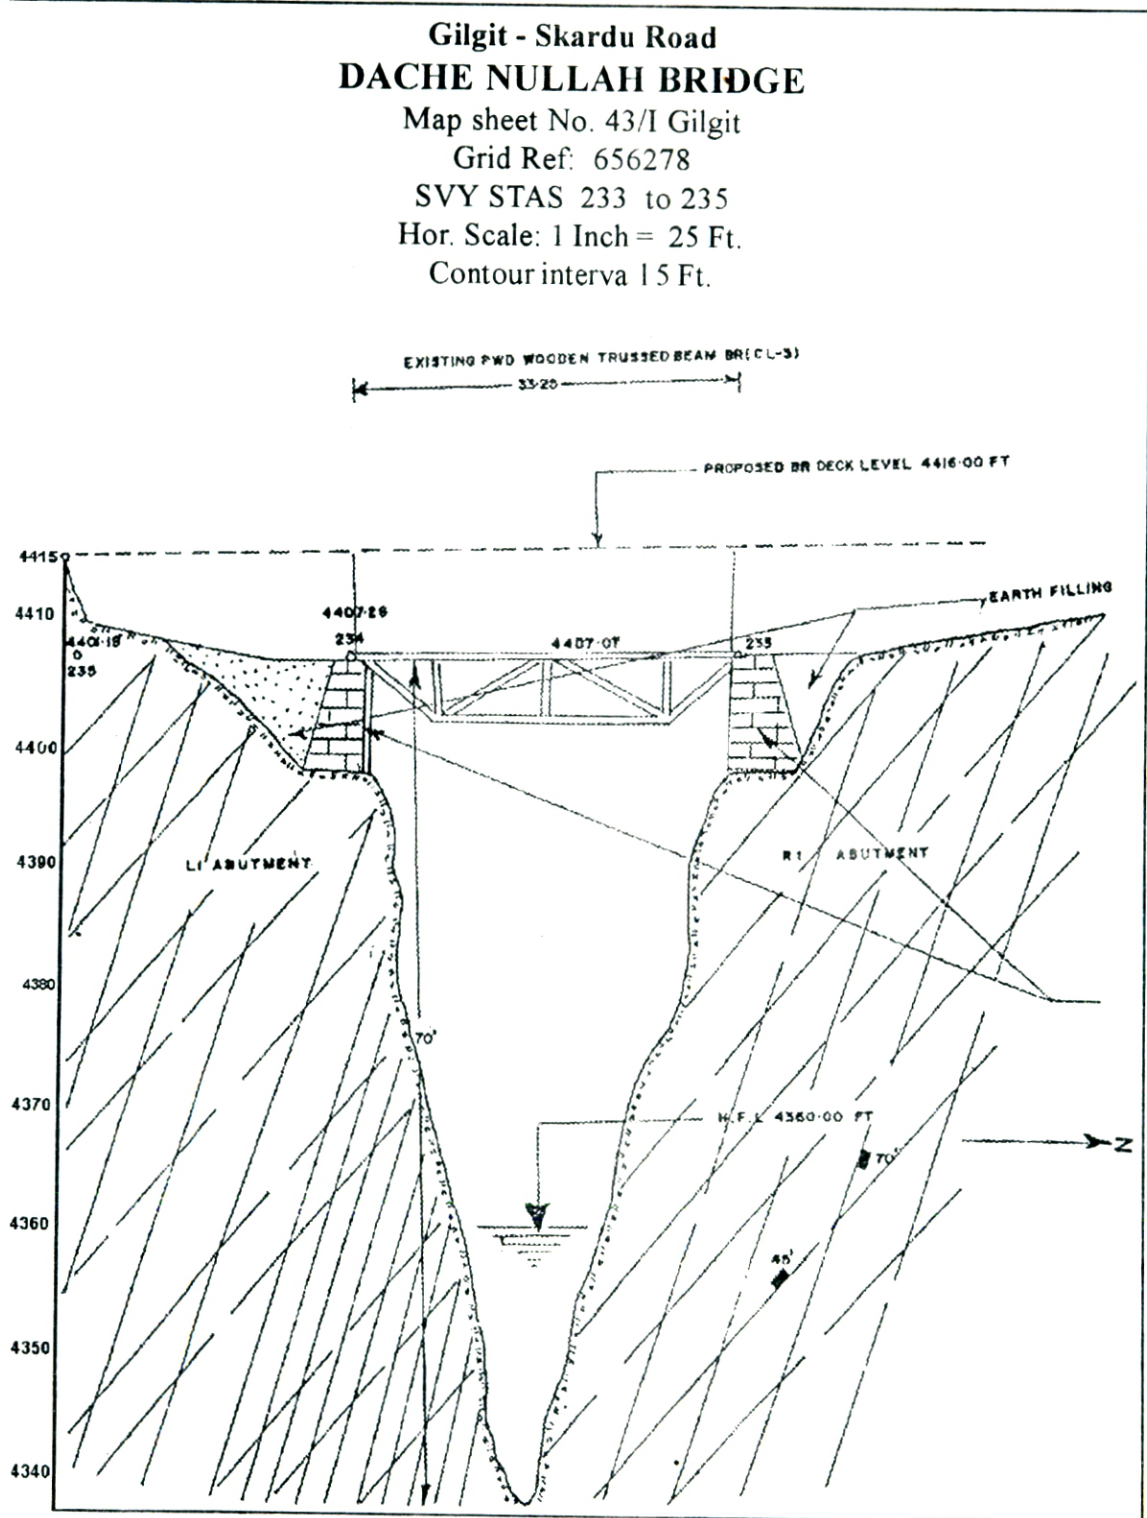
Geologic cross section at the proposed Dache Nullah bridge.
